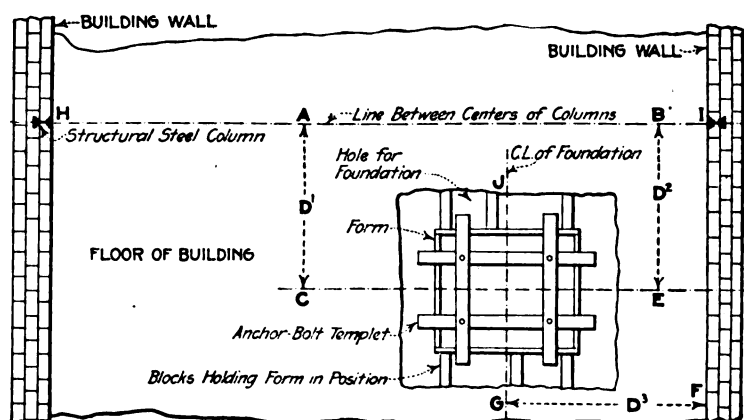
METHOD OF ALIGNING FOUNDATION TO TRUSS CENTER
